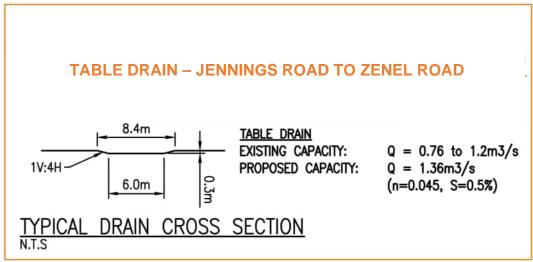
Jennings Road to Zenel Road Table Drain Upgrade
